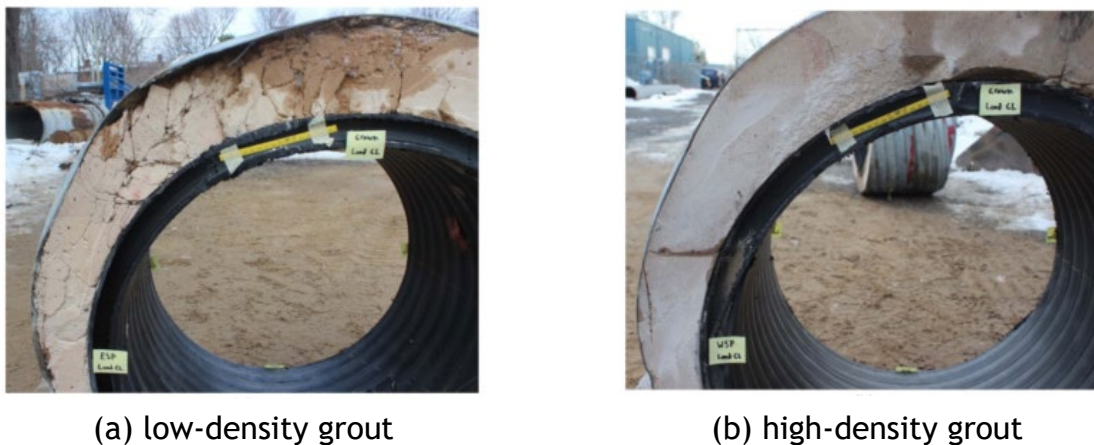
Cross-sectional views after test to failure of sections of exhumed samples that were directly under the loading pad (Tetreault et al. 2019).
